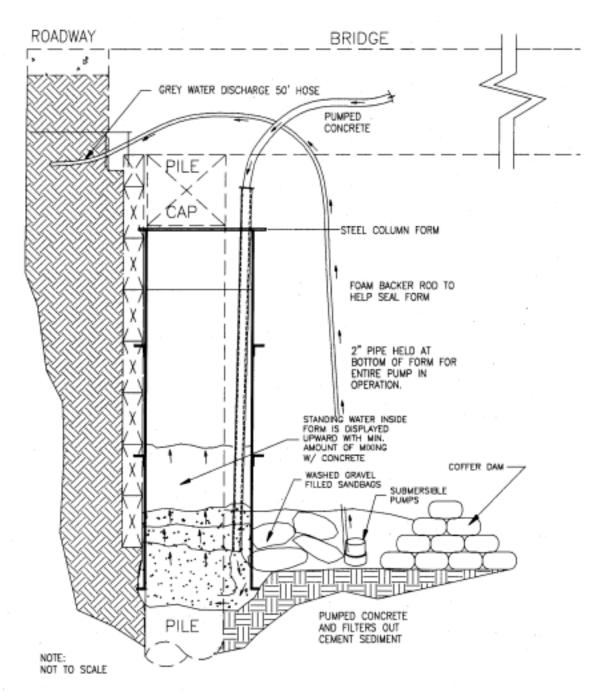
FIGURE: CONCRETE CONTAINMENT FOR BRIDGE ABUTMENT SCOUR REPAIR WORK
